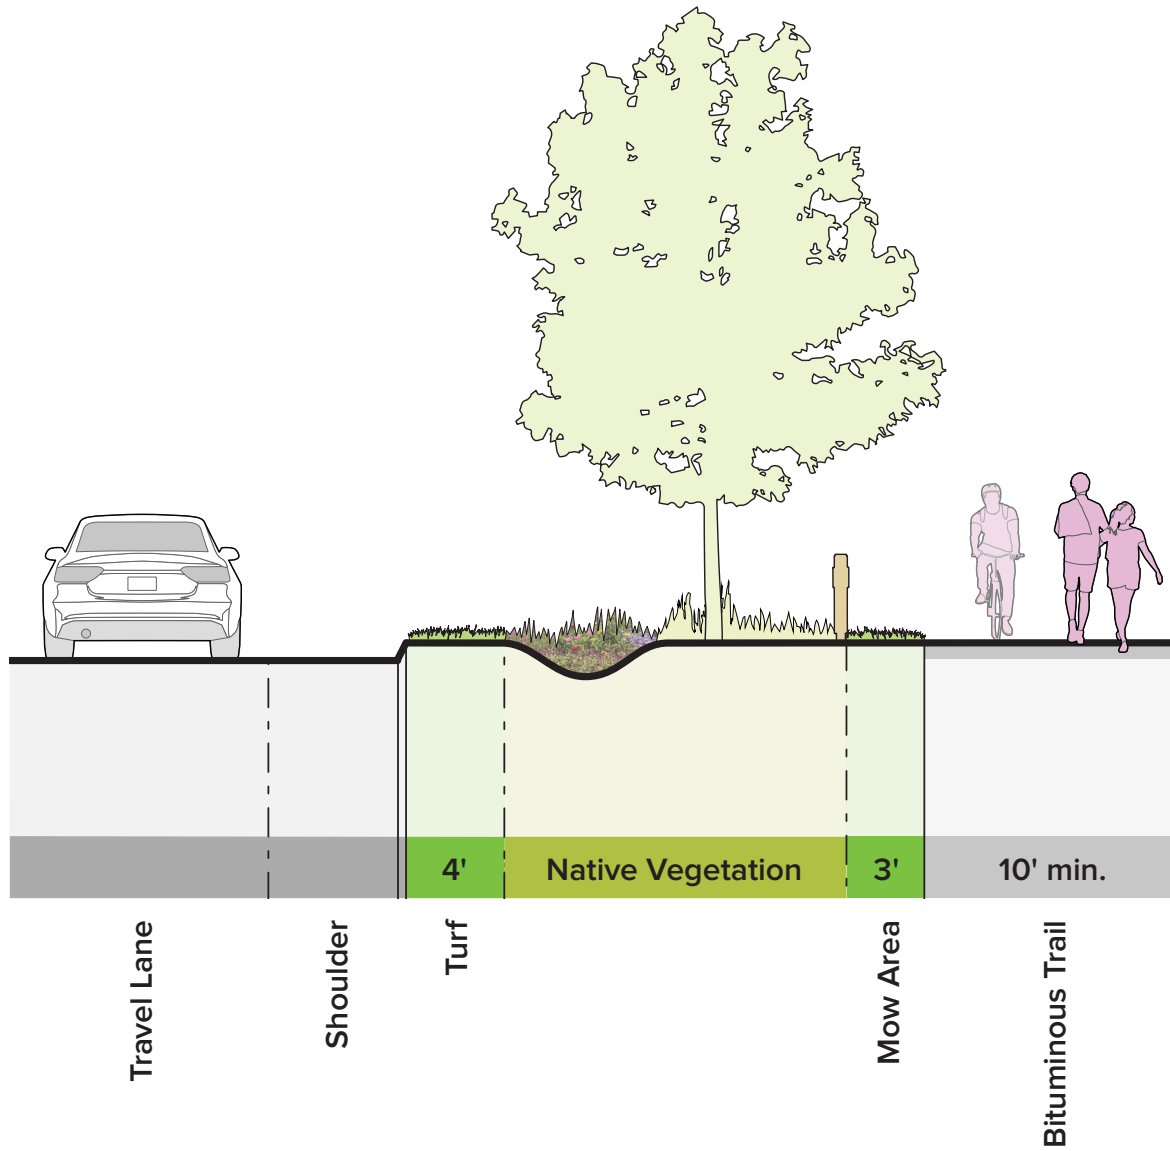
SUBURBAN CROSS-SECTION ALONG ROAD
